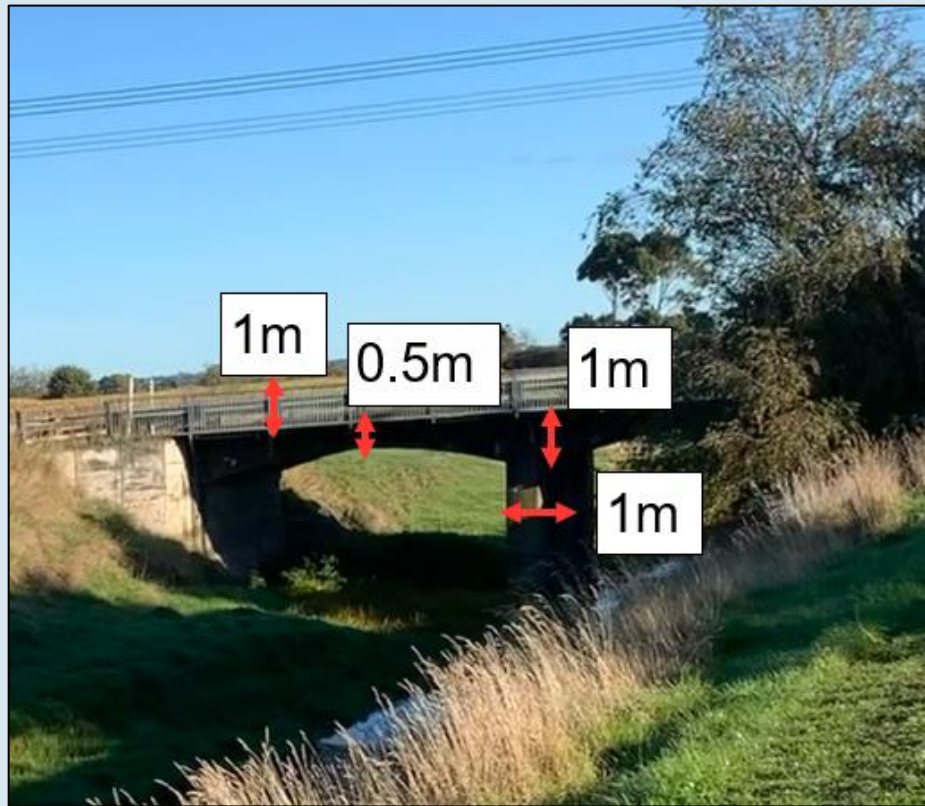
Flyers Line estimated bridge dimensions of rail height, central deck height, pier deck height and pier width.
